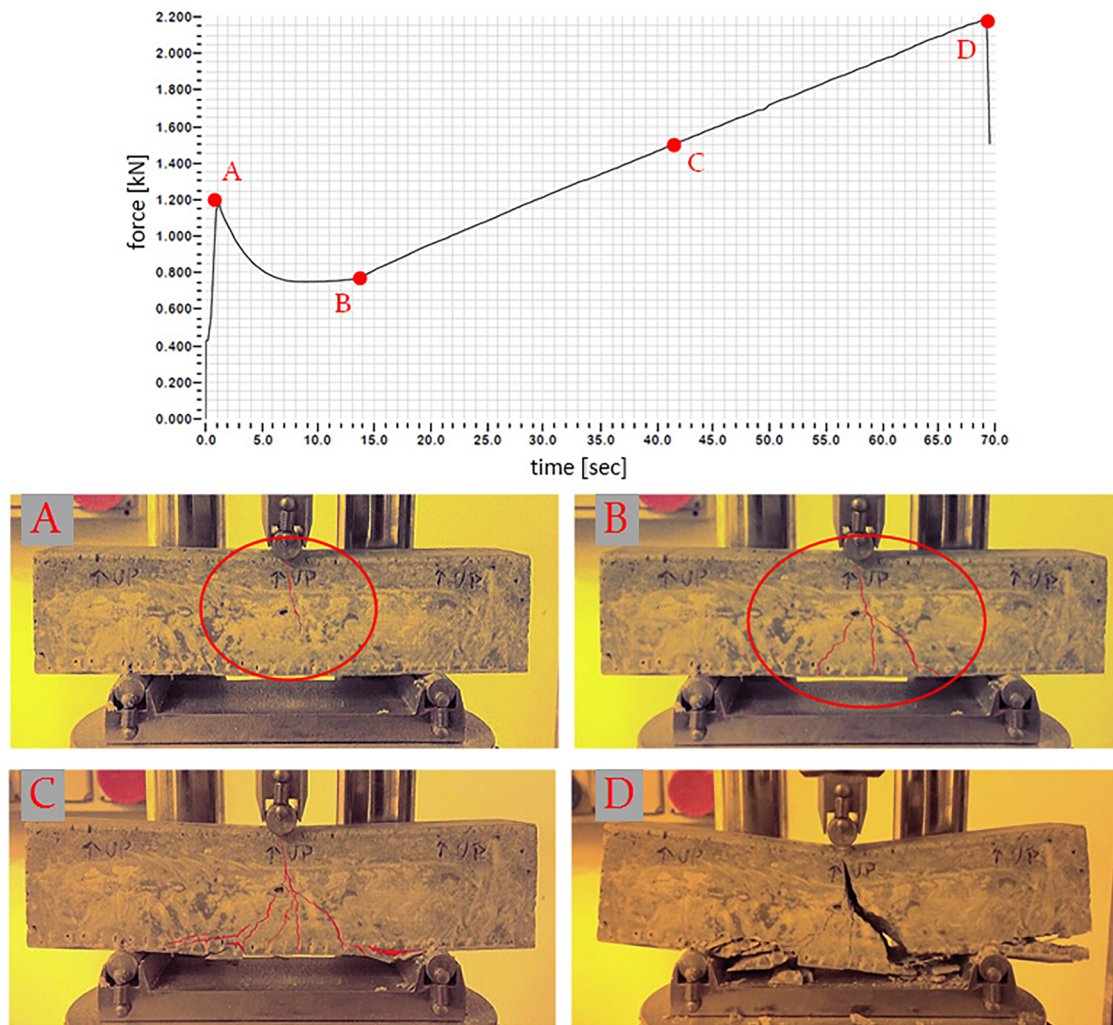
Load-versus-time graph of beam #3G cured in air (top) and failure mode progression at different load steps (bottom) – typical bond failure with detachment of concrete substrate from reinforcement.
